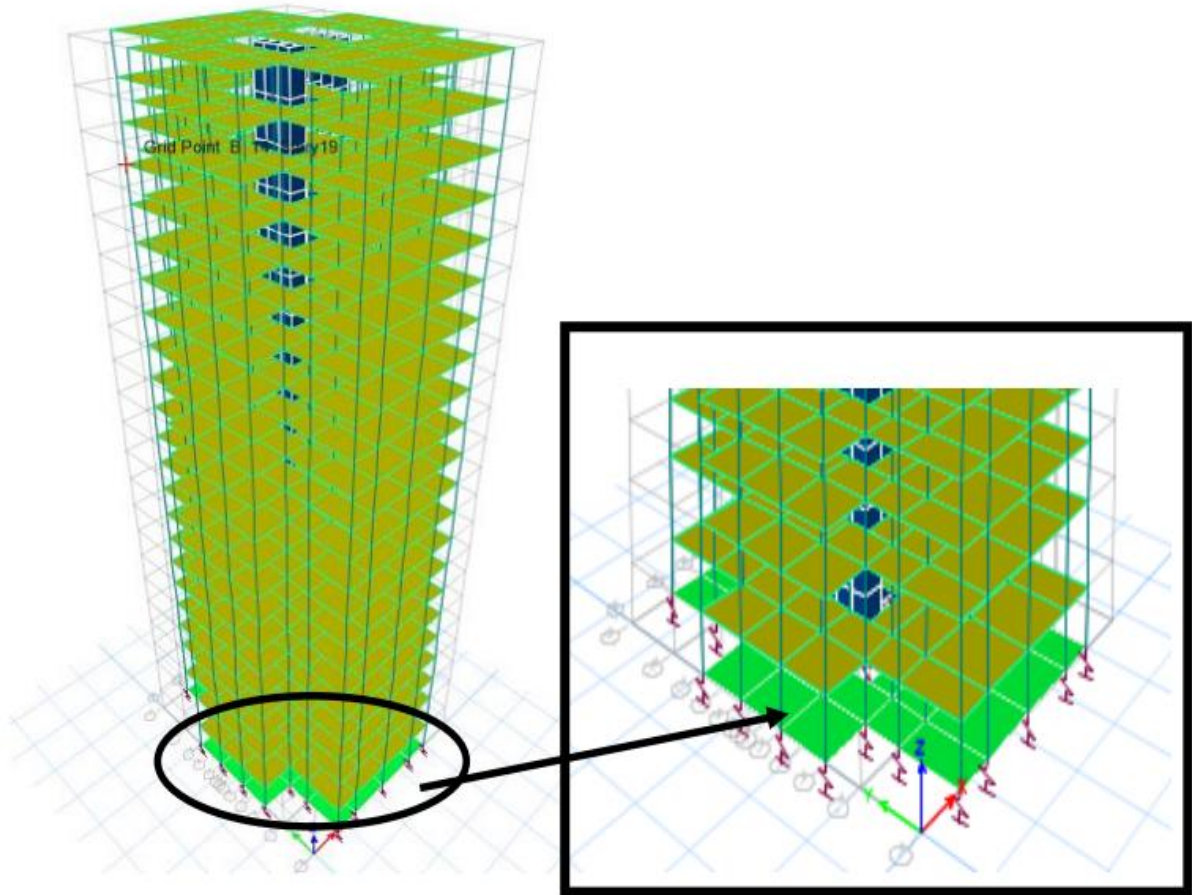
Structural 3D framing with subgrade reaction of soils [20]
